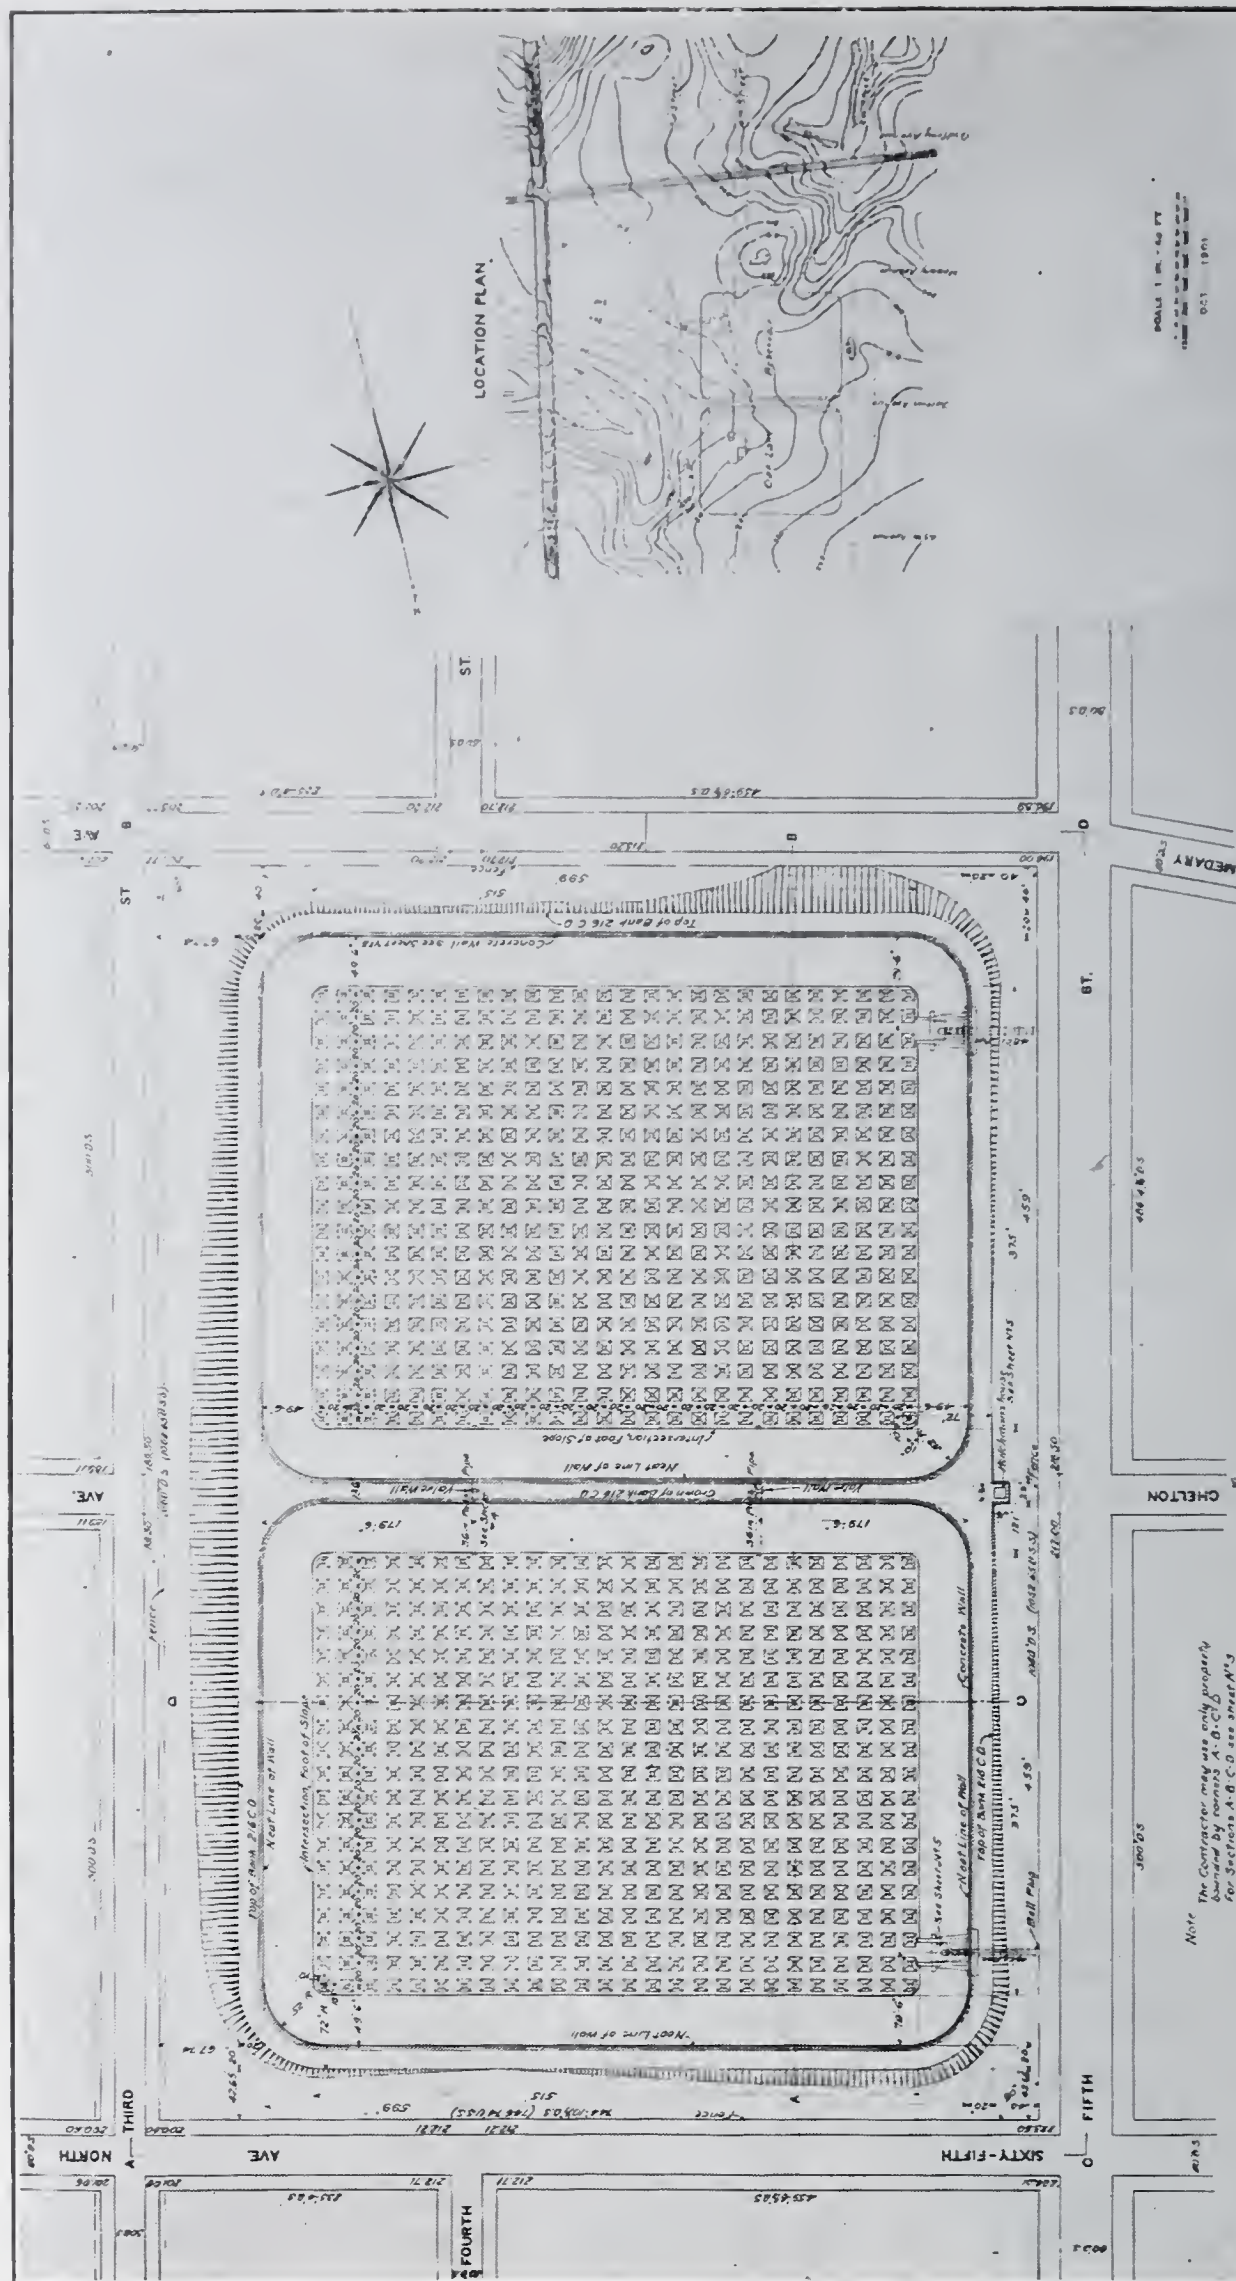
OAK LANE RESERVOIR—GENERAL PLAN.
